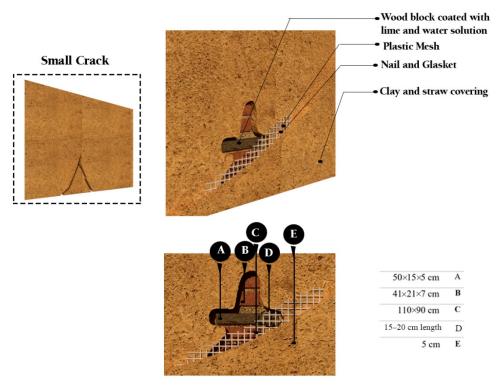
Example of architectural detail for conservation of a small crack in the wall (for instance, 40 cm width).
